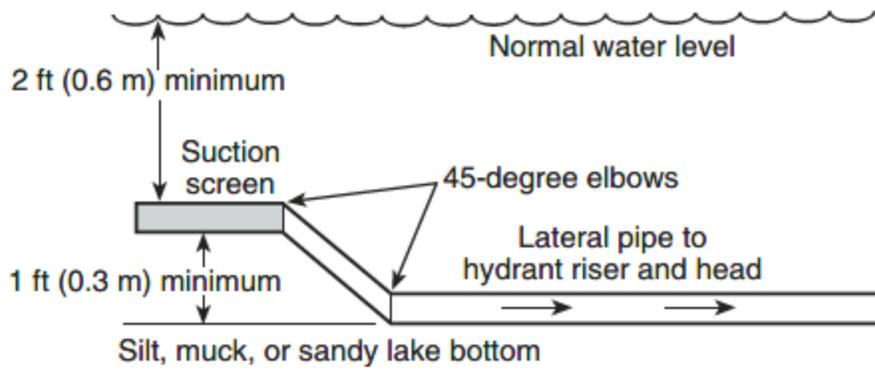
(a) Offset Screen Installation for Silt and Mud Conditions.
